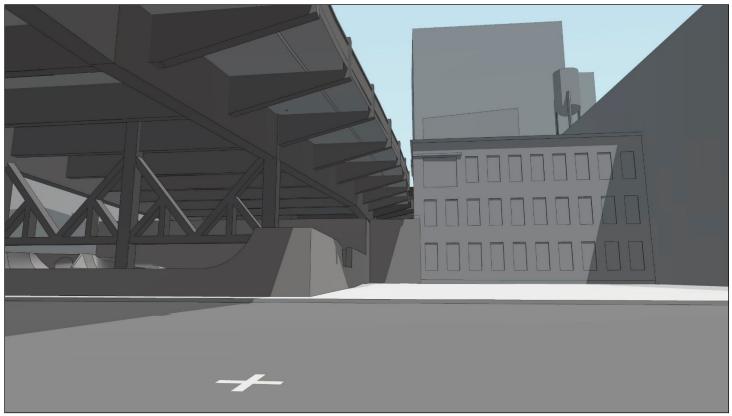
Frigidaire Building, artist's rendering of existing conditions (Fat Pencil Studio, 2021), view looking east.
